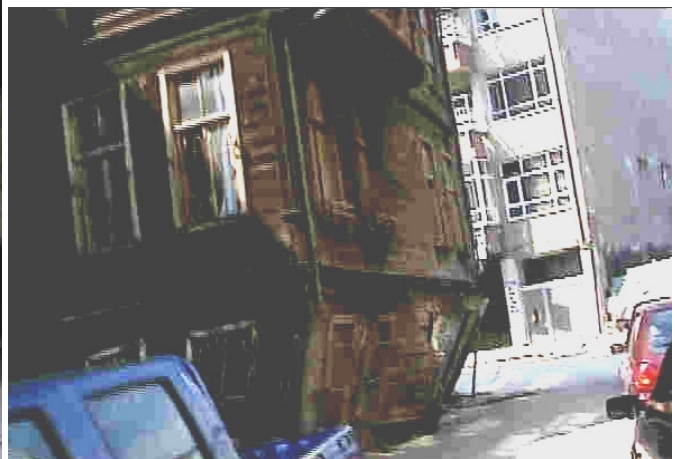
Hinge column failure of Bagdadi house in Adapazari
